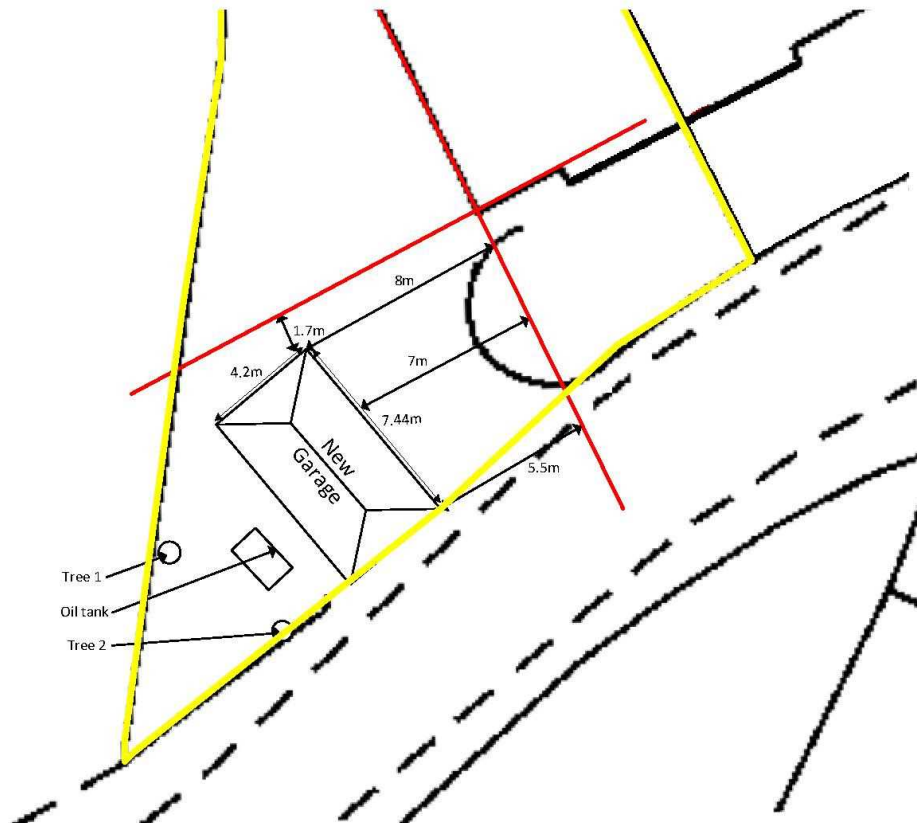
1:200 Site Plan (Red cross for reference, Yellow line denotes site boundary)
